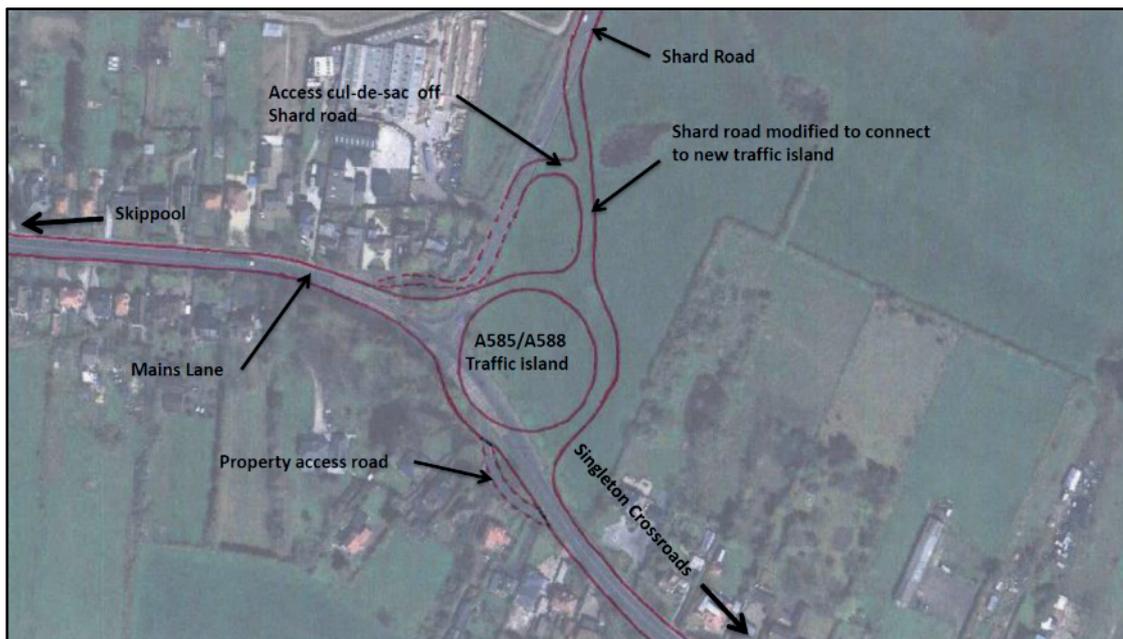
Proposed layout for Mains Lane and Shard Road Junction
